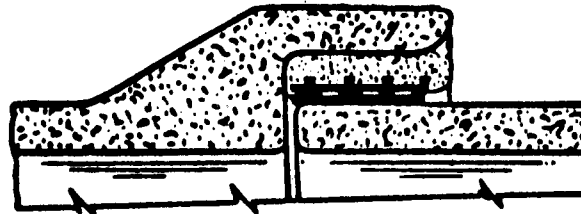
Cast-iron pipe and vitrified sewer pipe joint.
